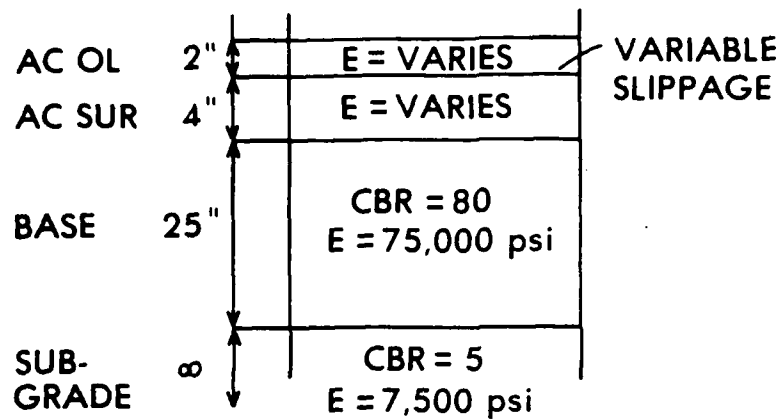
ASPHALT PAVEMENT SECTION AND PROPERTIES
